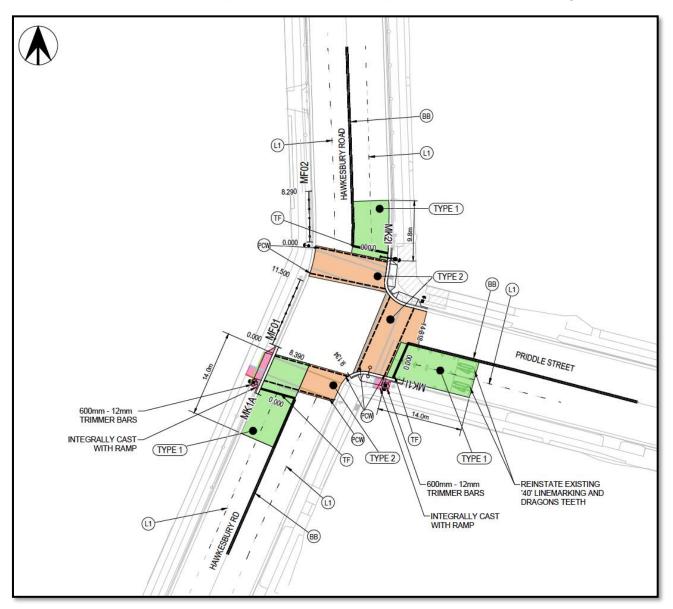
Hawkesbury Rd at Priddle St Pavement works
